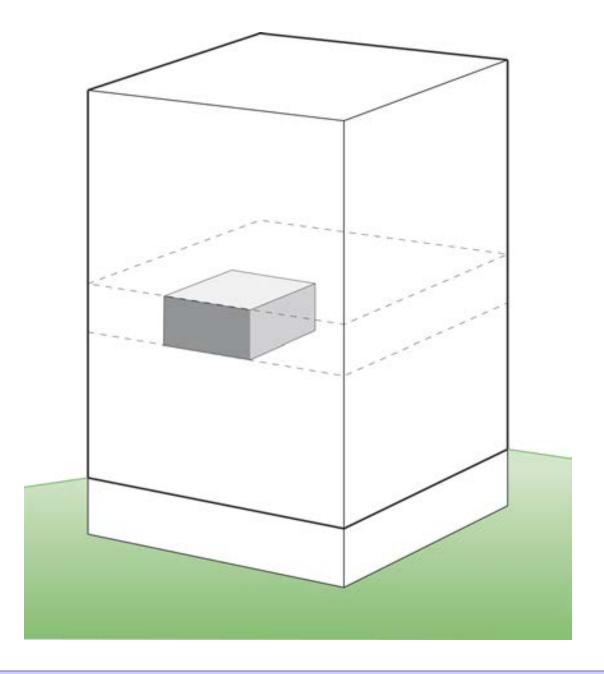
Apartment building with tighter apartment entry doors (Adapted from G.O. Handegord, 1998)
